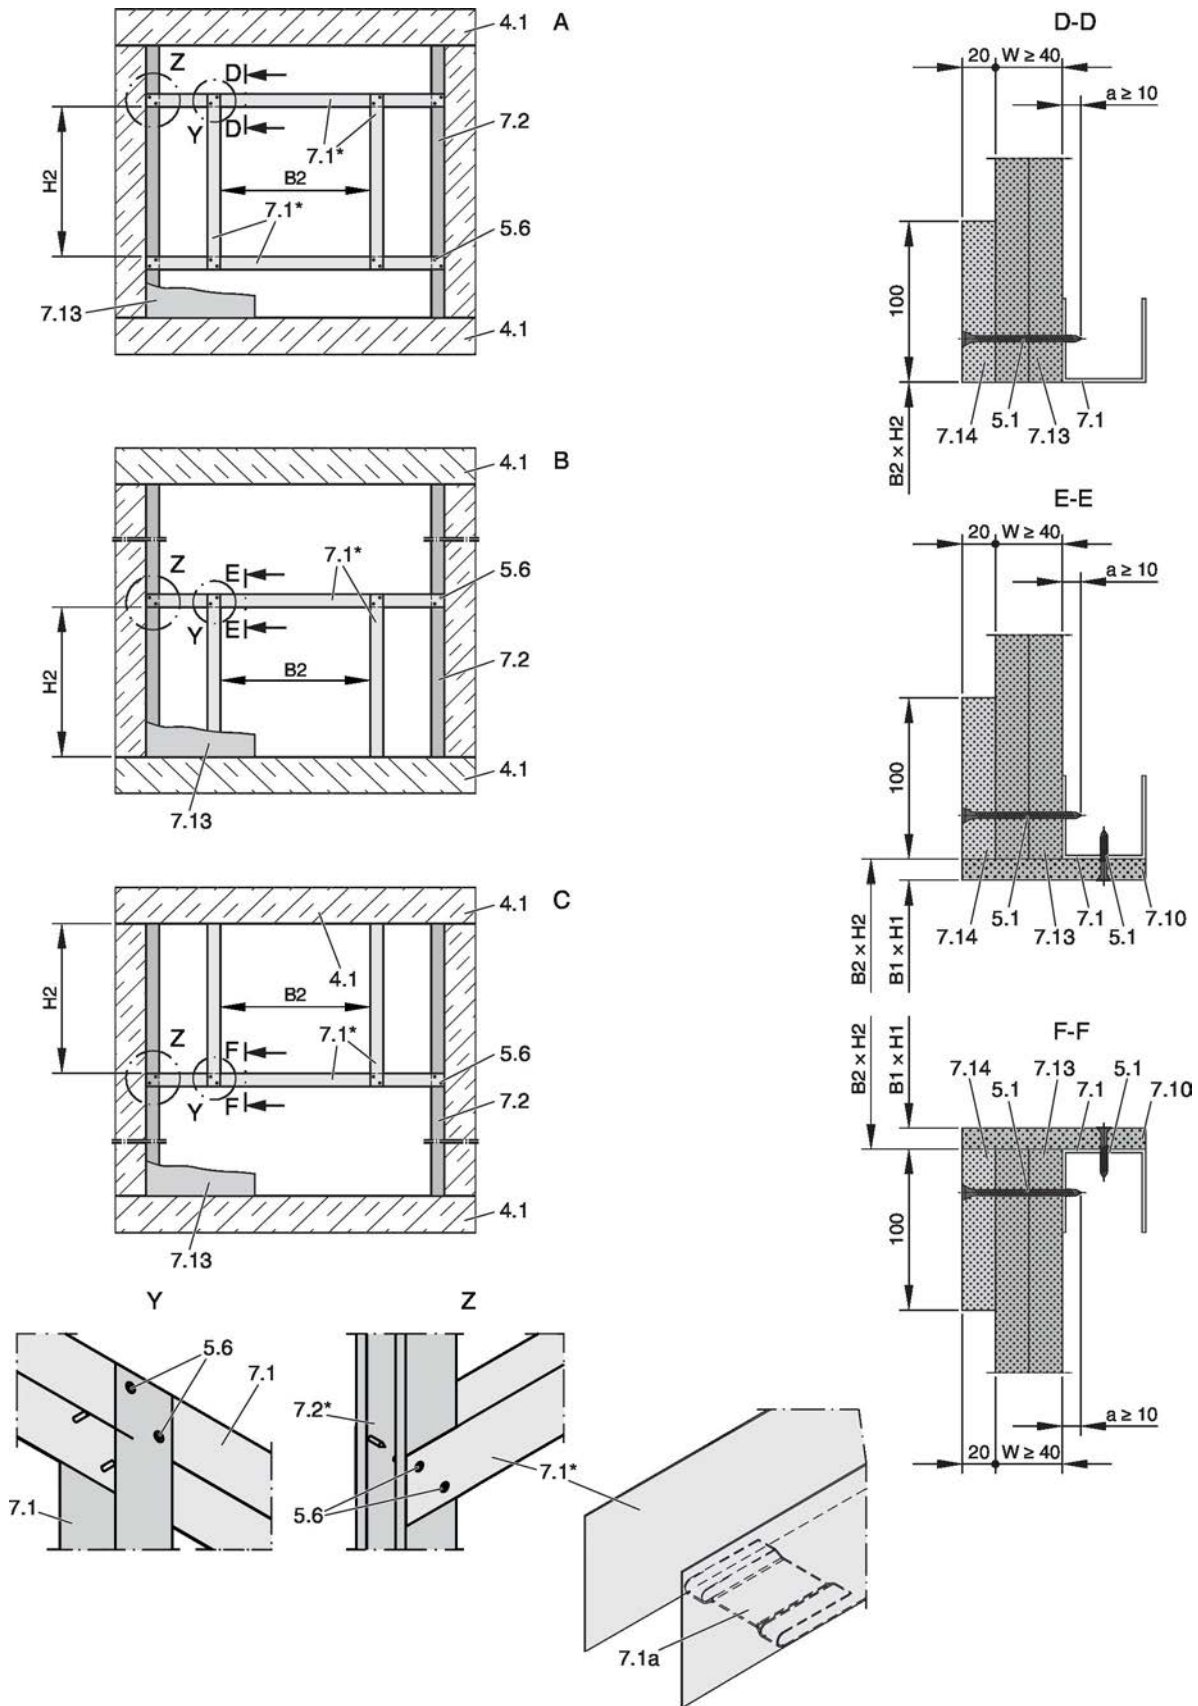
Shaft wall without metal support structure and with cladding on one side
